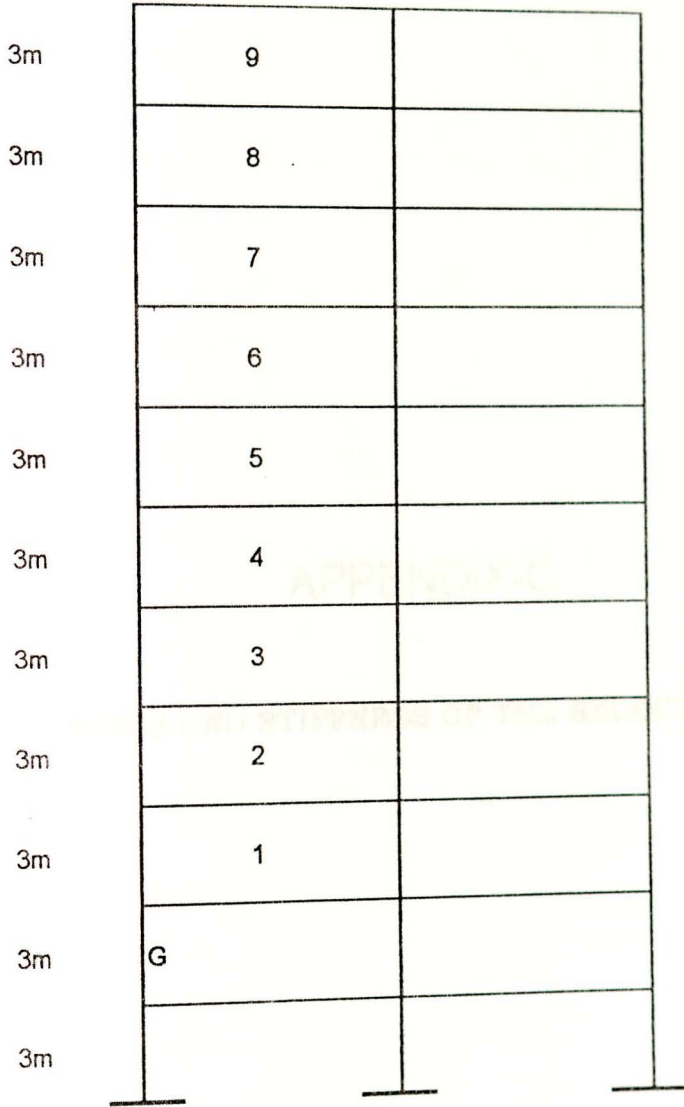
MINISTRY OF JUSTICE BUILDING ELEVATION.
